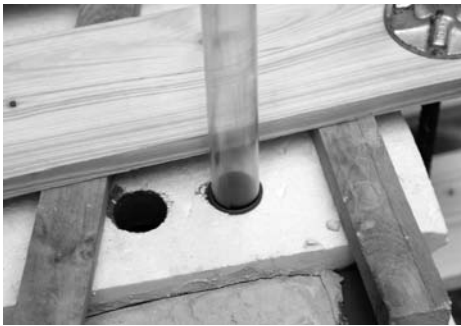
Closed formwork for one concrete element of *Möbiusban(k)d* ready for concreting
